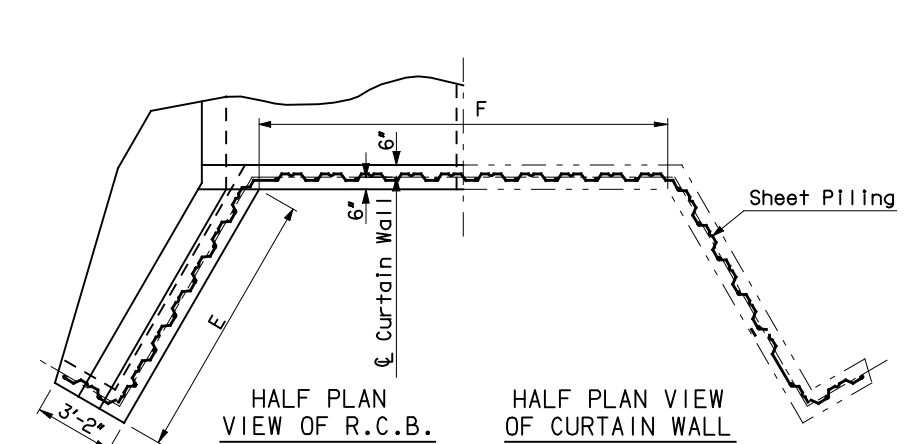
DETAIL OF ALTERNATE CURTAIN WALL UNDER BARREL
